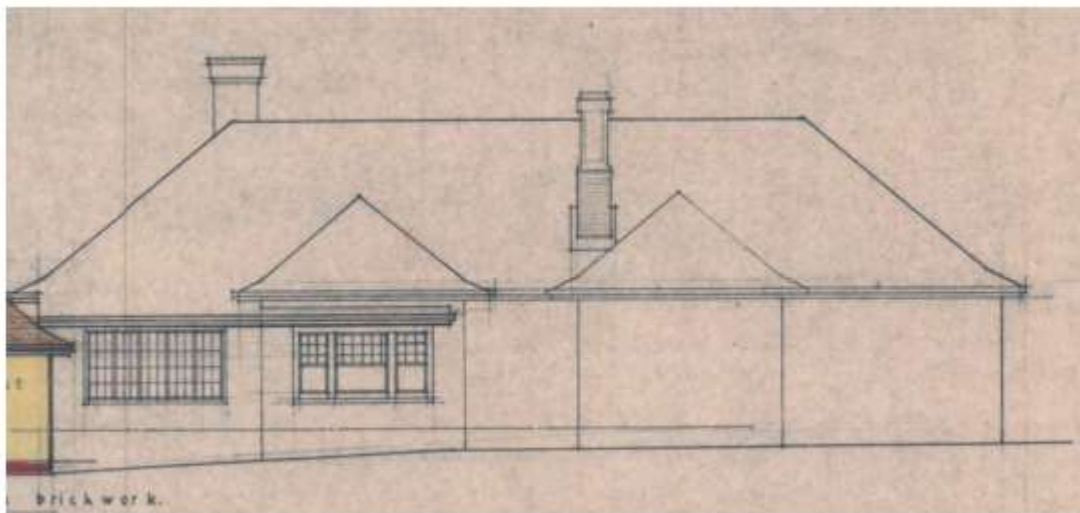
West elevation, facing Griffiths Grove, in 1987, showing separate roofs above bay windows and a chimney on this elevation. (Source: BP 2395/1987)
